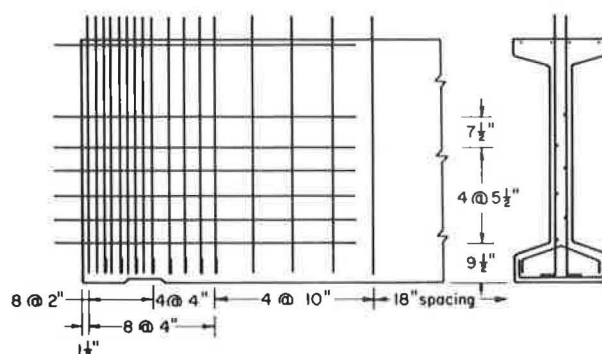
Details of steel reinforcement for Series 10 girder.
